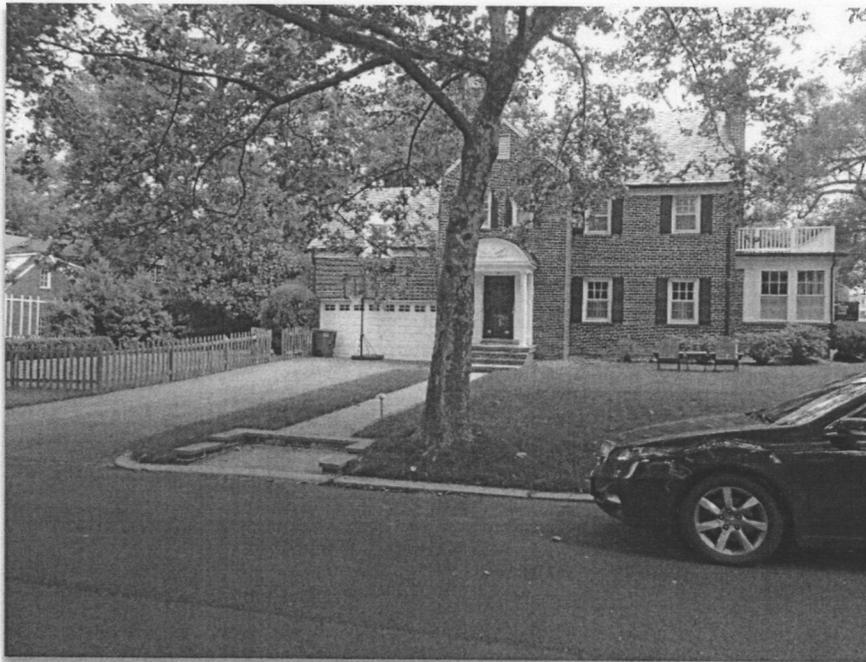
The walkway after expansion showing the two structures alongside the new riser and walkway.
